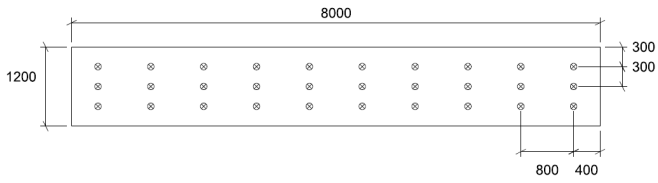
Placing of the points for hammer testing along the concrete deck
